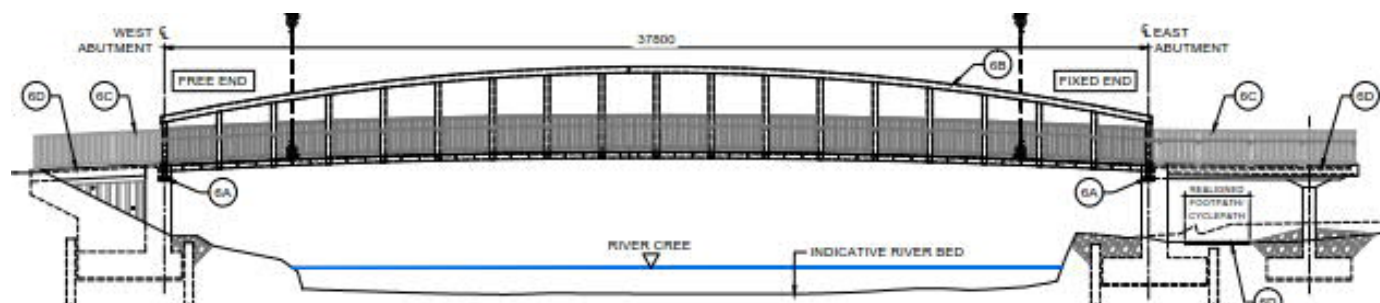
PROPOSED SPARLING BRIDGE CROSS SECTION
